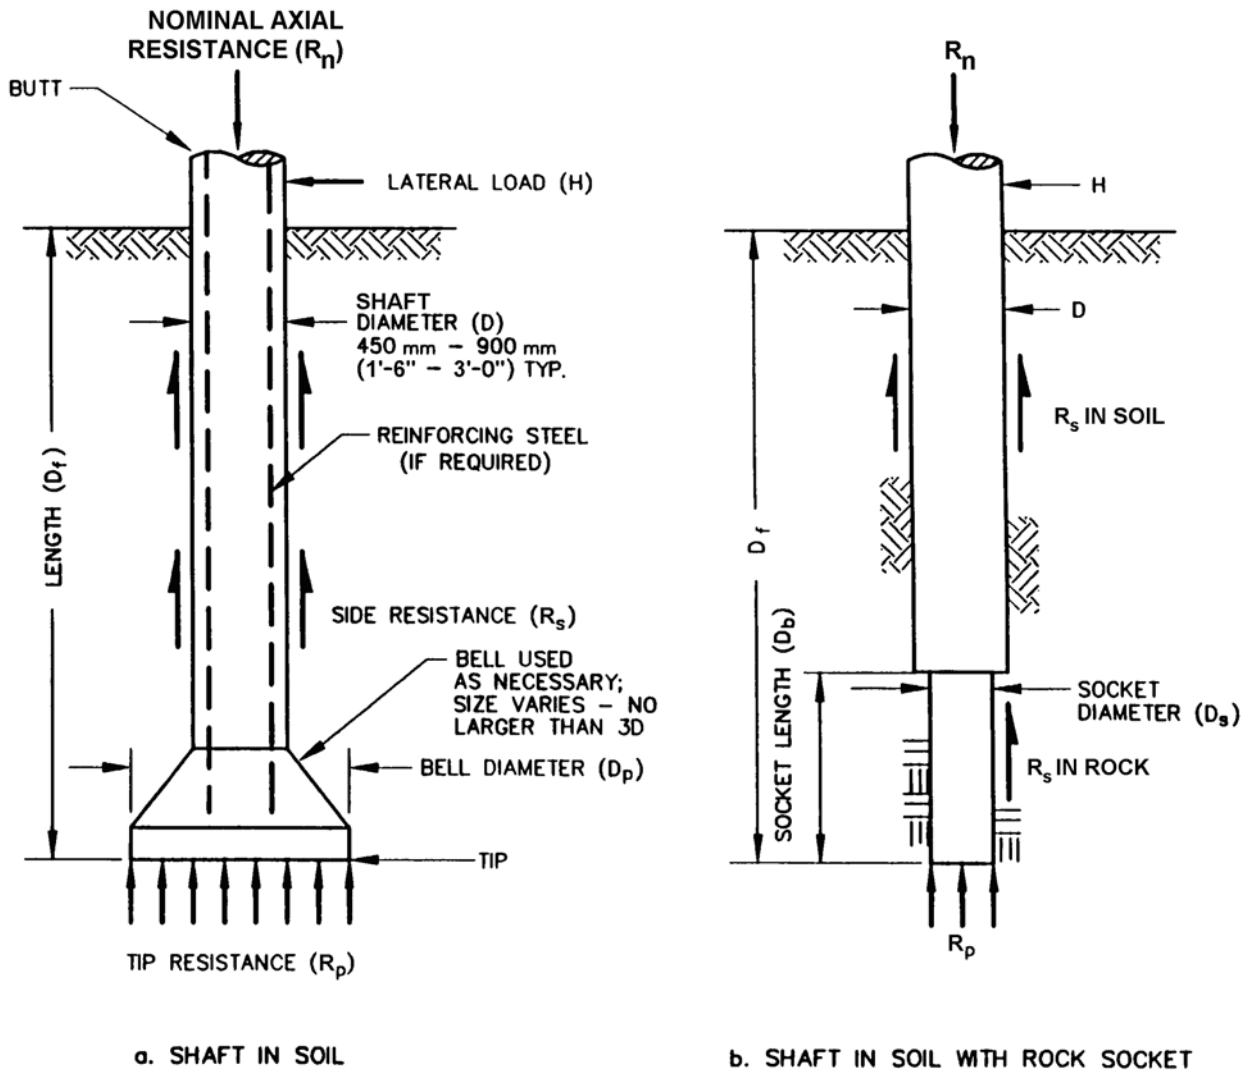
Design Terminology for Drilled Shaft Foundations
